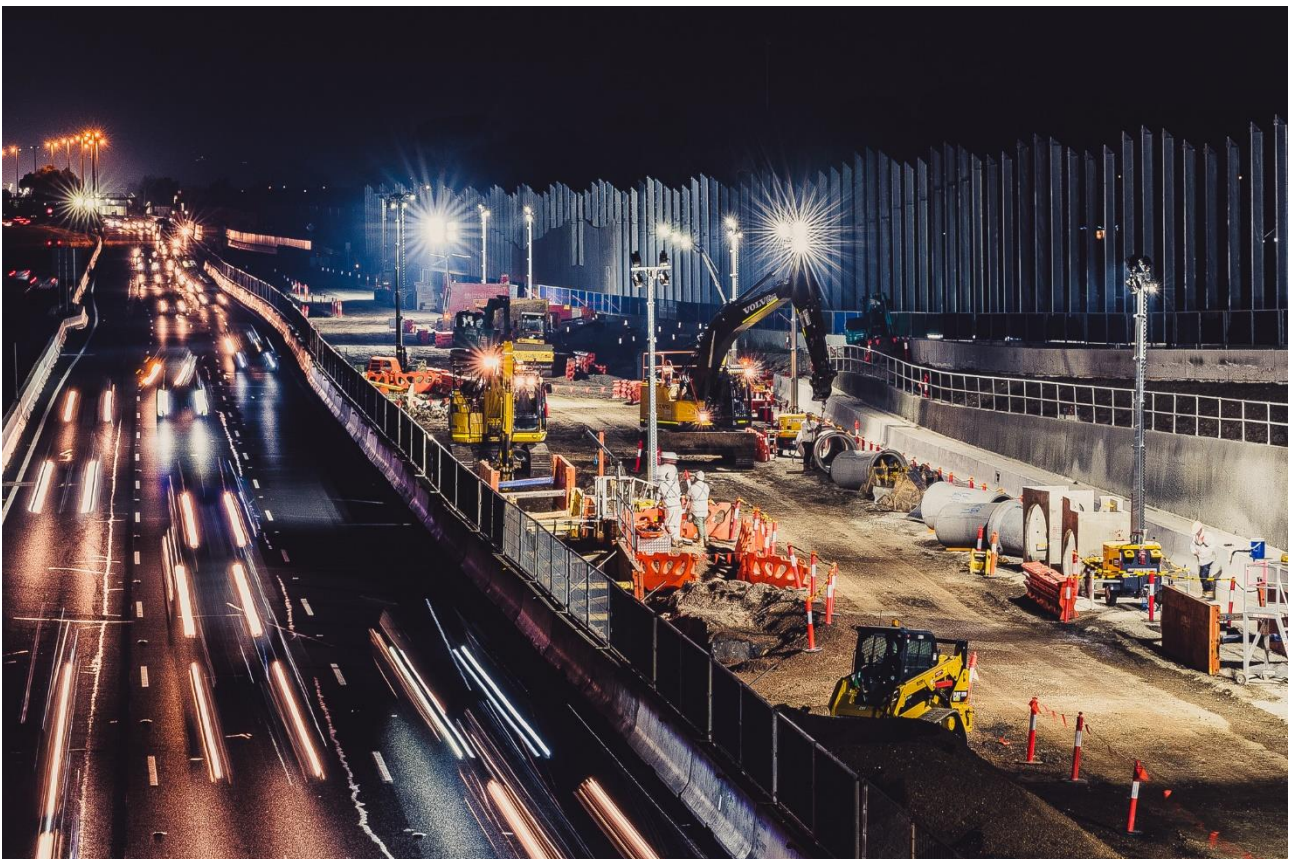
West Gate Freeway Grieve Parade night works – West Zone (Source: WGTP MTIA, 20 February 2020)
